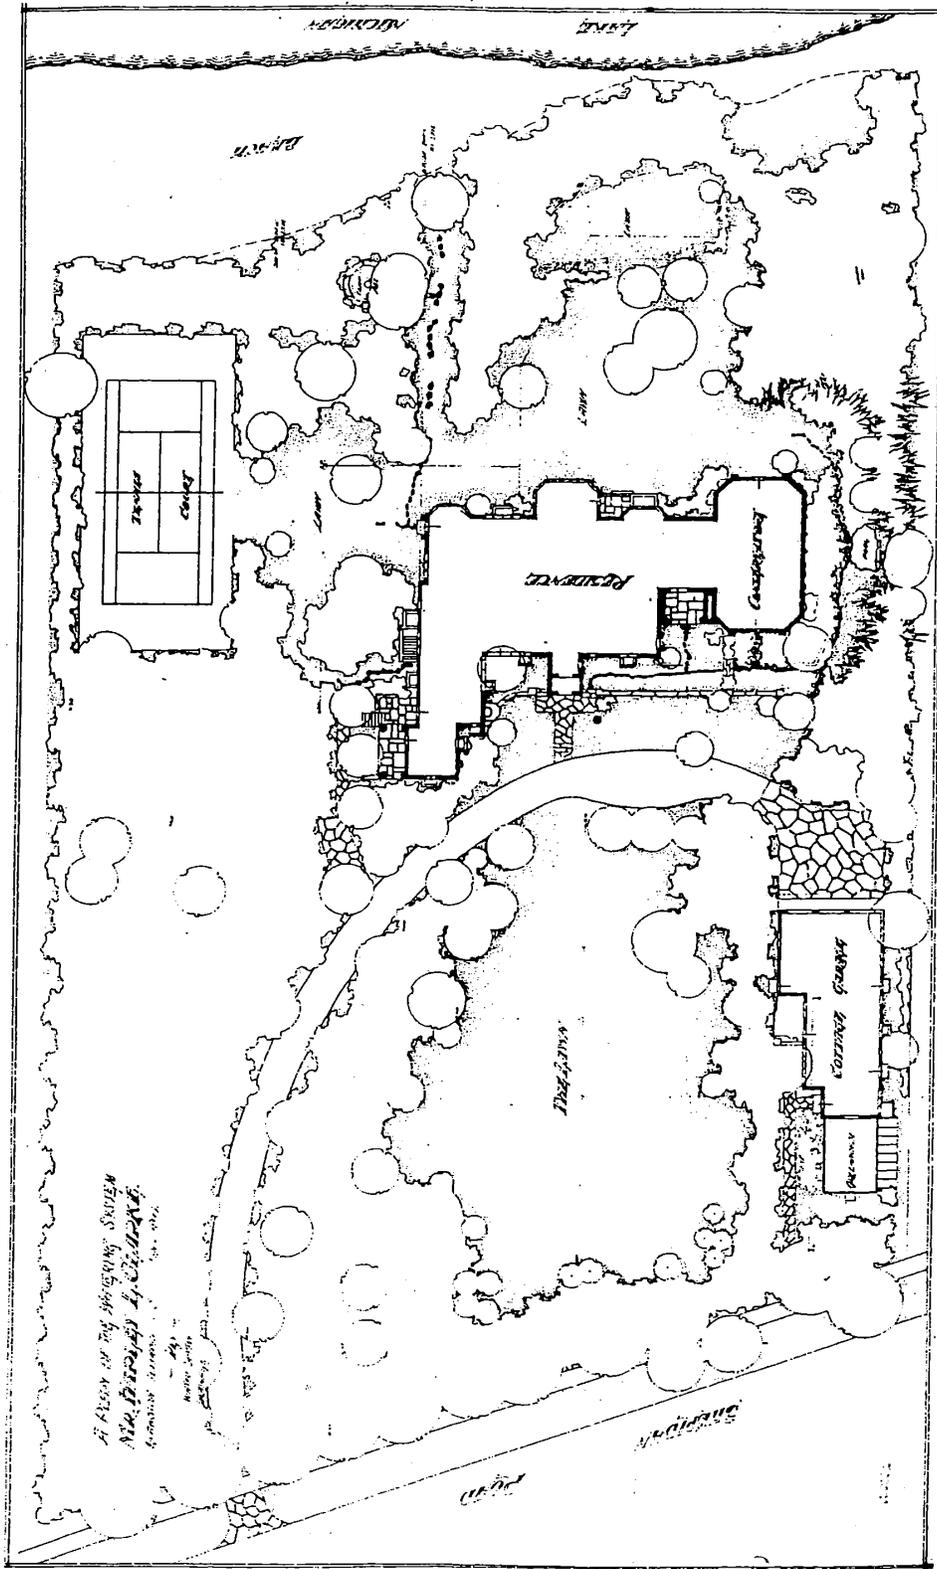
JENSEN'S WATERING SYSTEM PLAN
